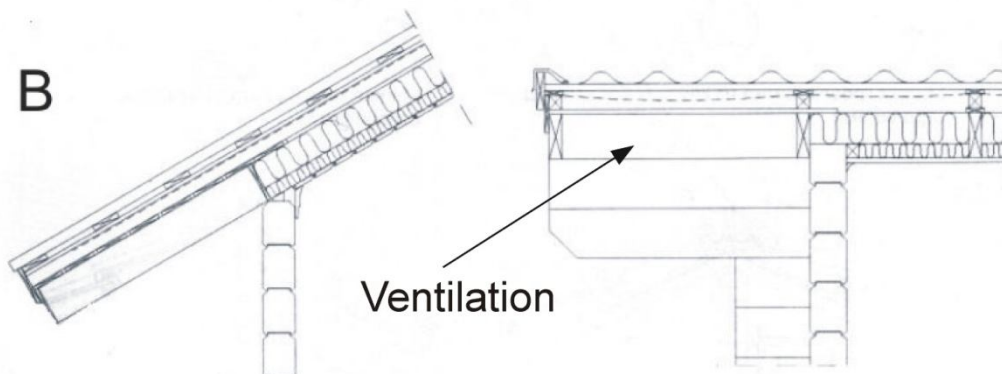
Different kinds of roofs and eaves, B – Tin roofing
